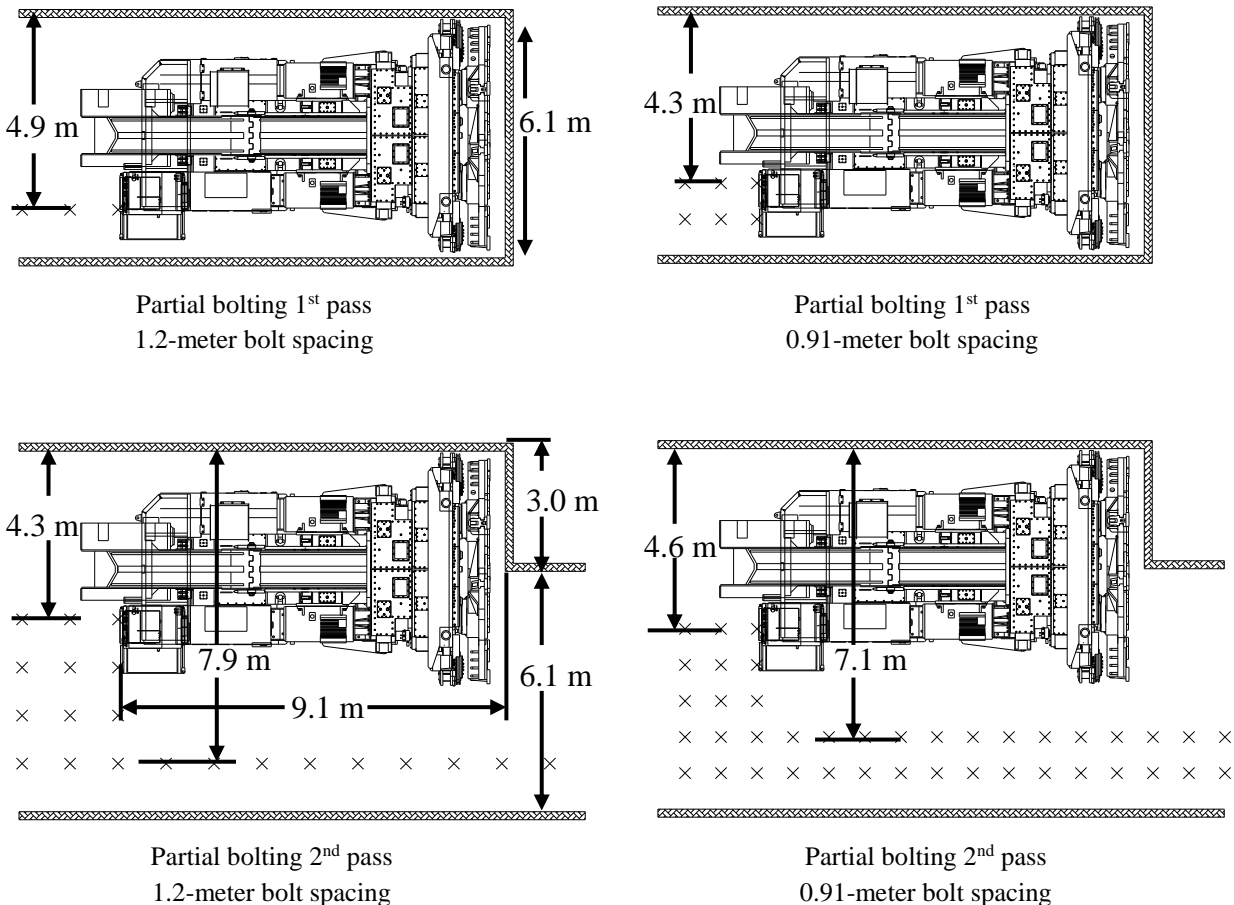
The proposed locations of installed bolts in a partially bolted ground support plan. The proposed method of bolting the entire machine width is similar except that in second pass bolts would be installed up to the wall pictured on top of the borer. Behind the borer, bolts could potentially be installed 20 cm from the rear of the boring machine. It can be seen that the bolt pattern with a 0.91 meter spacing has better coverage in both first and second pass than the 1.2-meter spaced pattern. The current bolting pattern is very different in that both passes are advanced 8 meters before installing bolts across the entire width of the entry.
